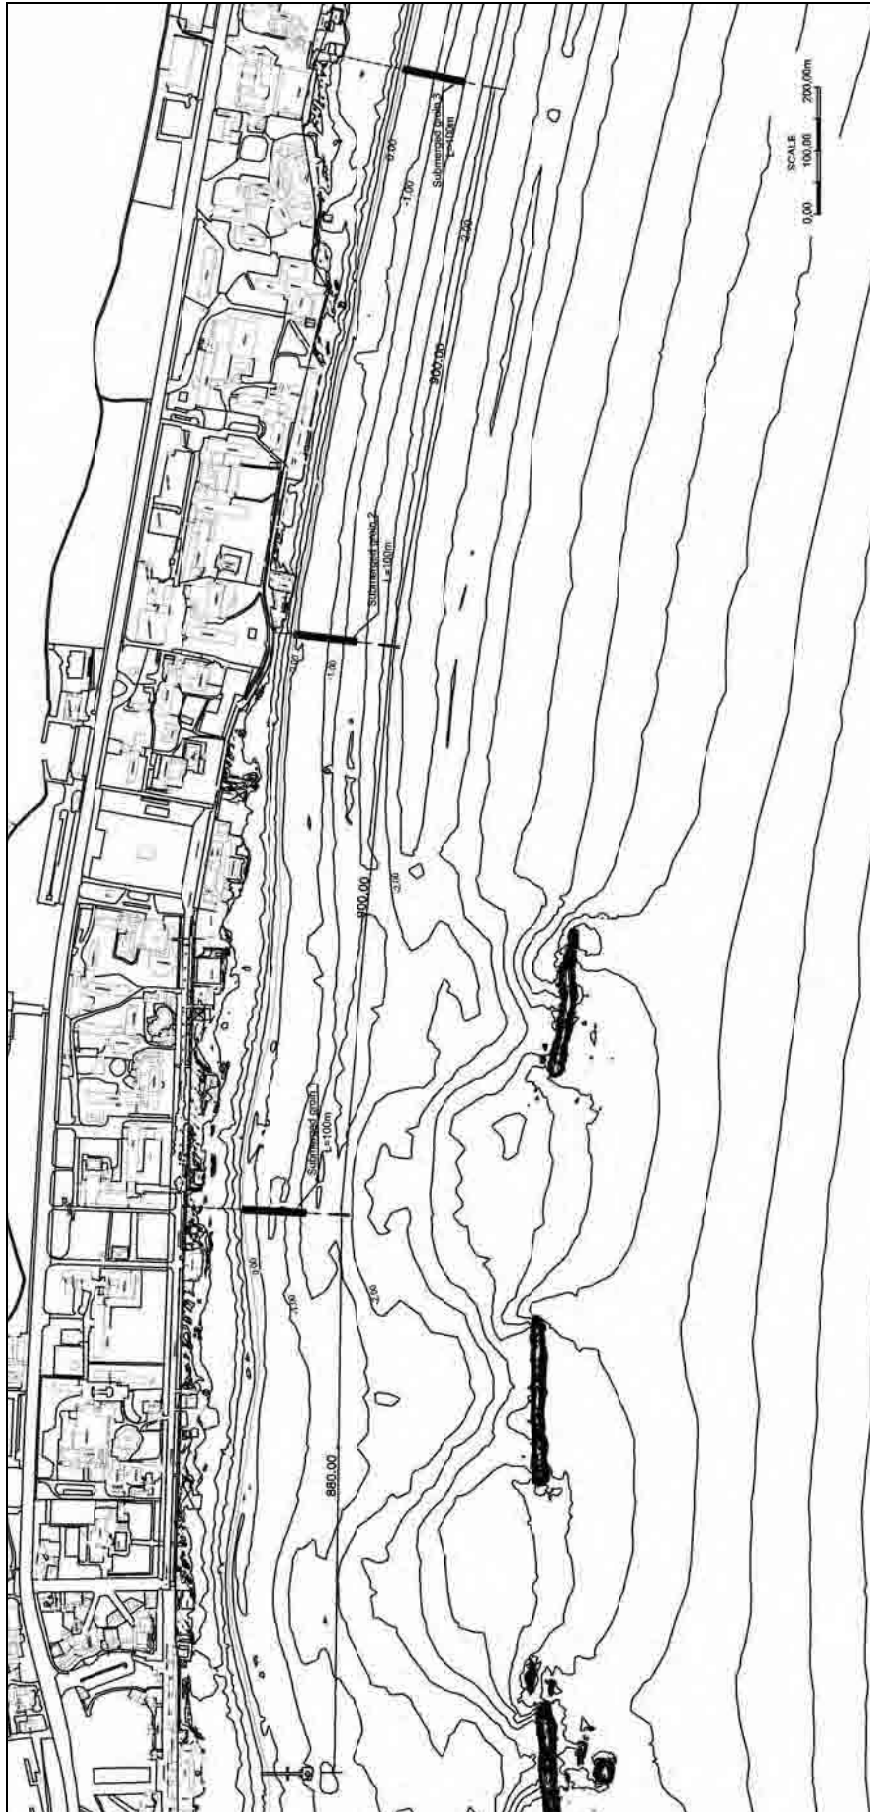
(2): General layout of shore protection facilities at Mamaia Sud with river sand (northern part)
